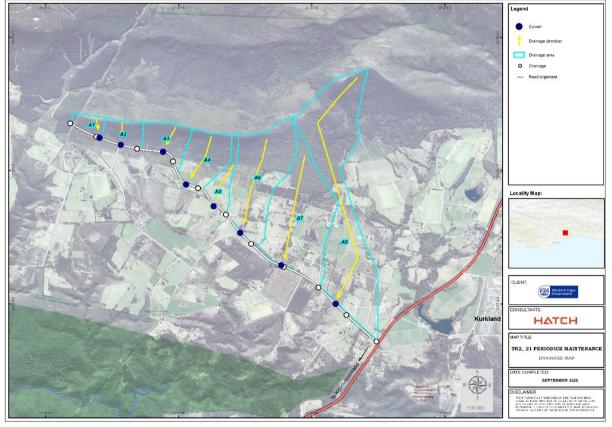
Drainage direction of the area surrounding the DR 1797 and the culverts required
